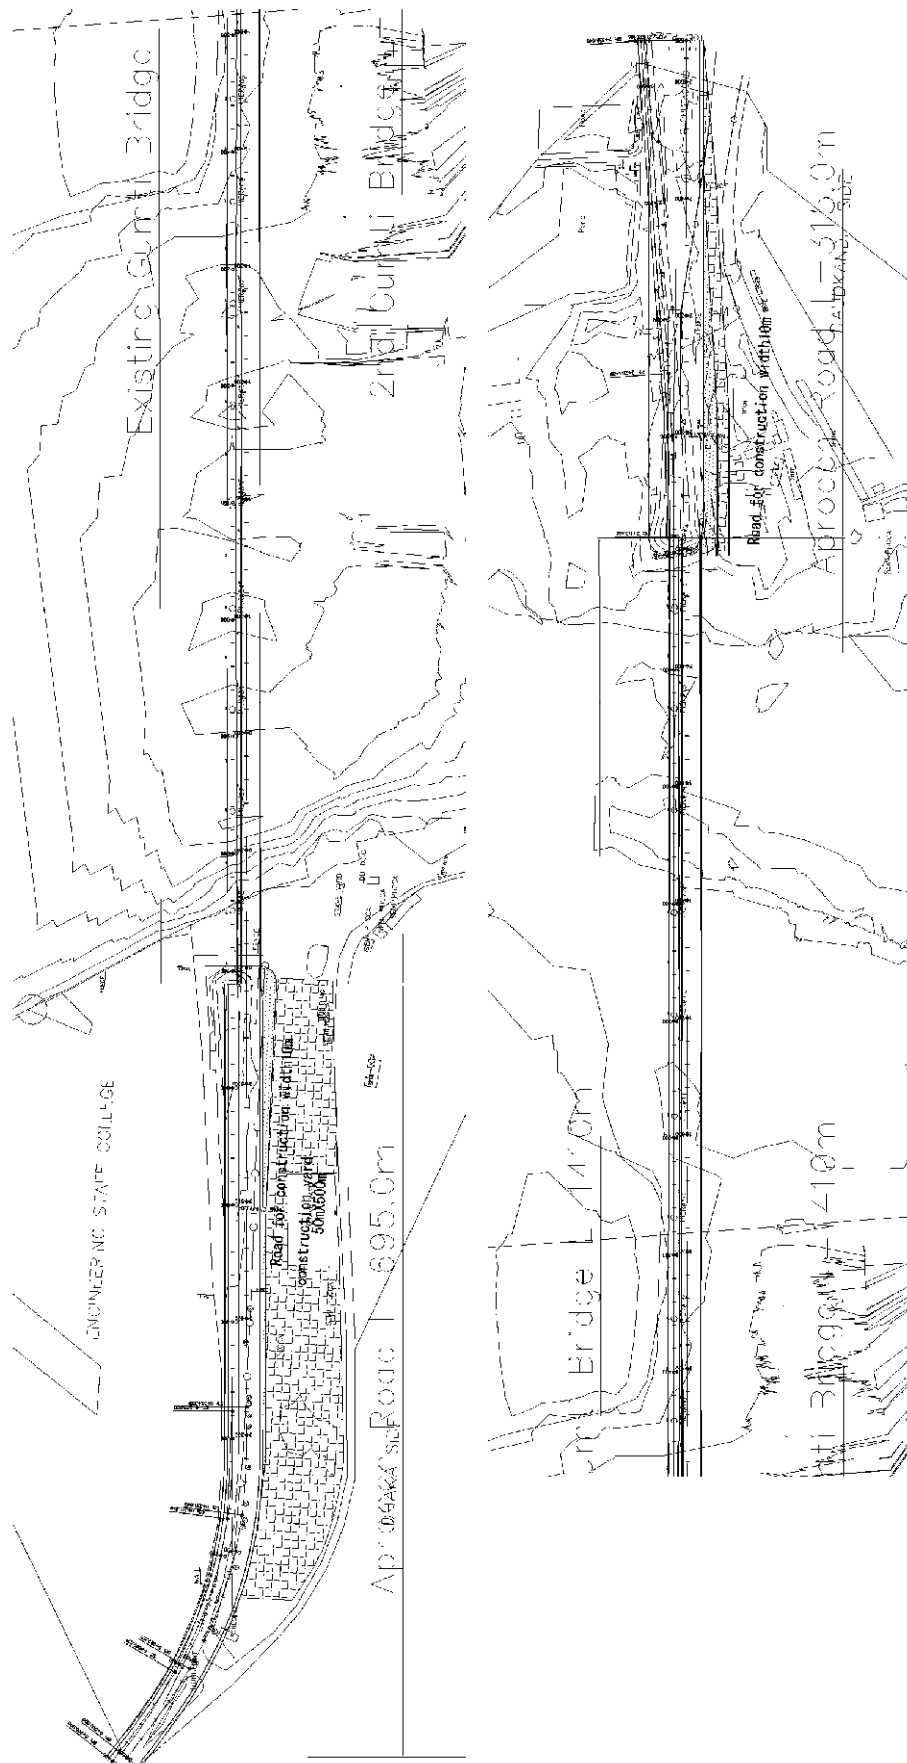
Construction Yard and Temporary Road at the Gumti Bridge Site
